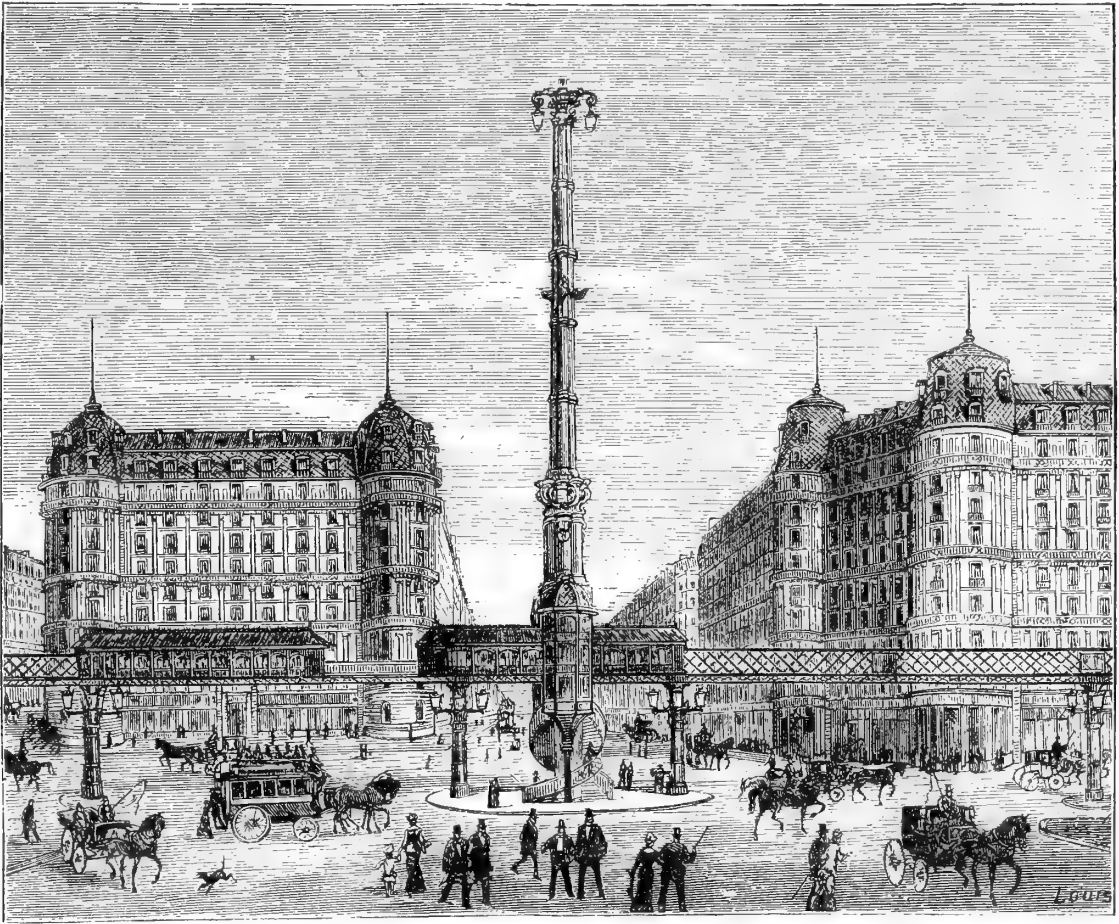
ELECTRIC ELEVATED RAILROAD FOR THE BOULEVARDS OF PARIS. PLAN OF M. CHRÉTIEN. VIEW OF A STATION.
